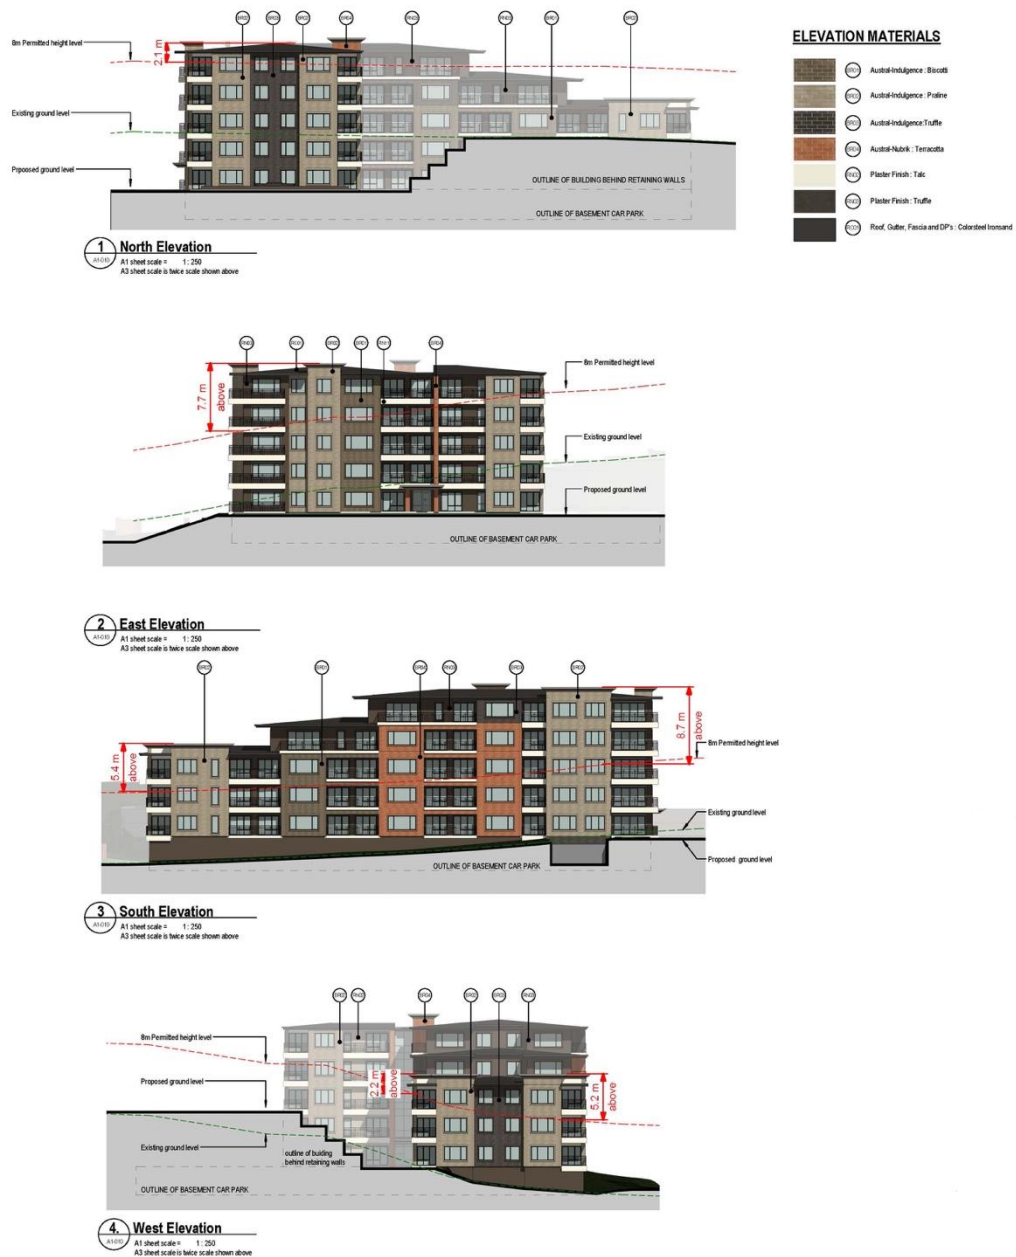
From top to bottom: The north, east, south and west elevations of Building B03 (Ryman Drawing A2-010 RC21).
